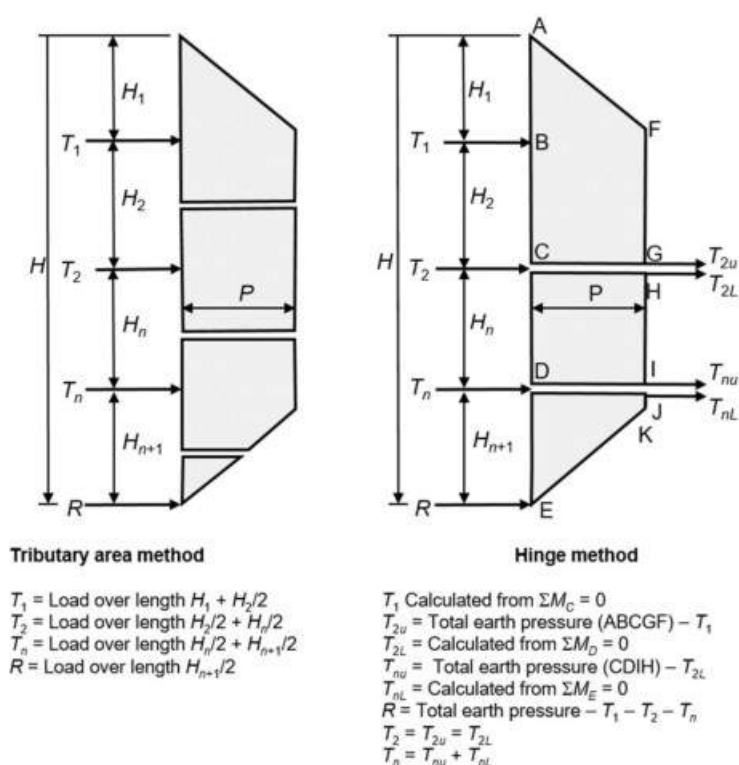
Calculation of Anchor Loads for Multilevel Wall after Sabatini et al. (1999)
